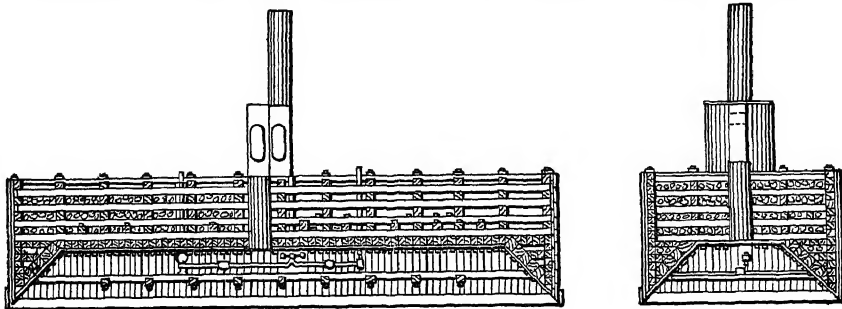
PNEUMATIC CAISSON FOR FOUNDATION OF A BRIDGE PIER
